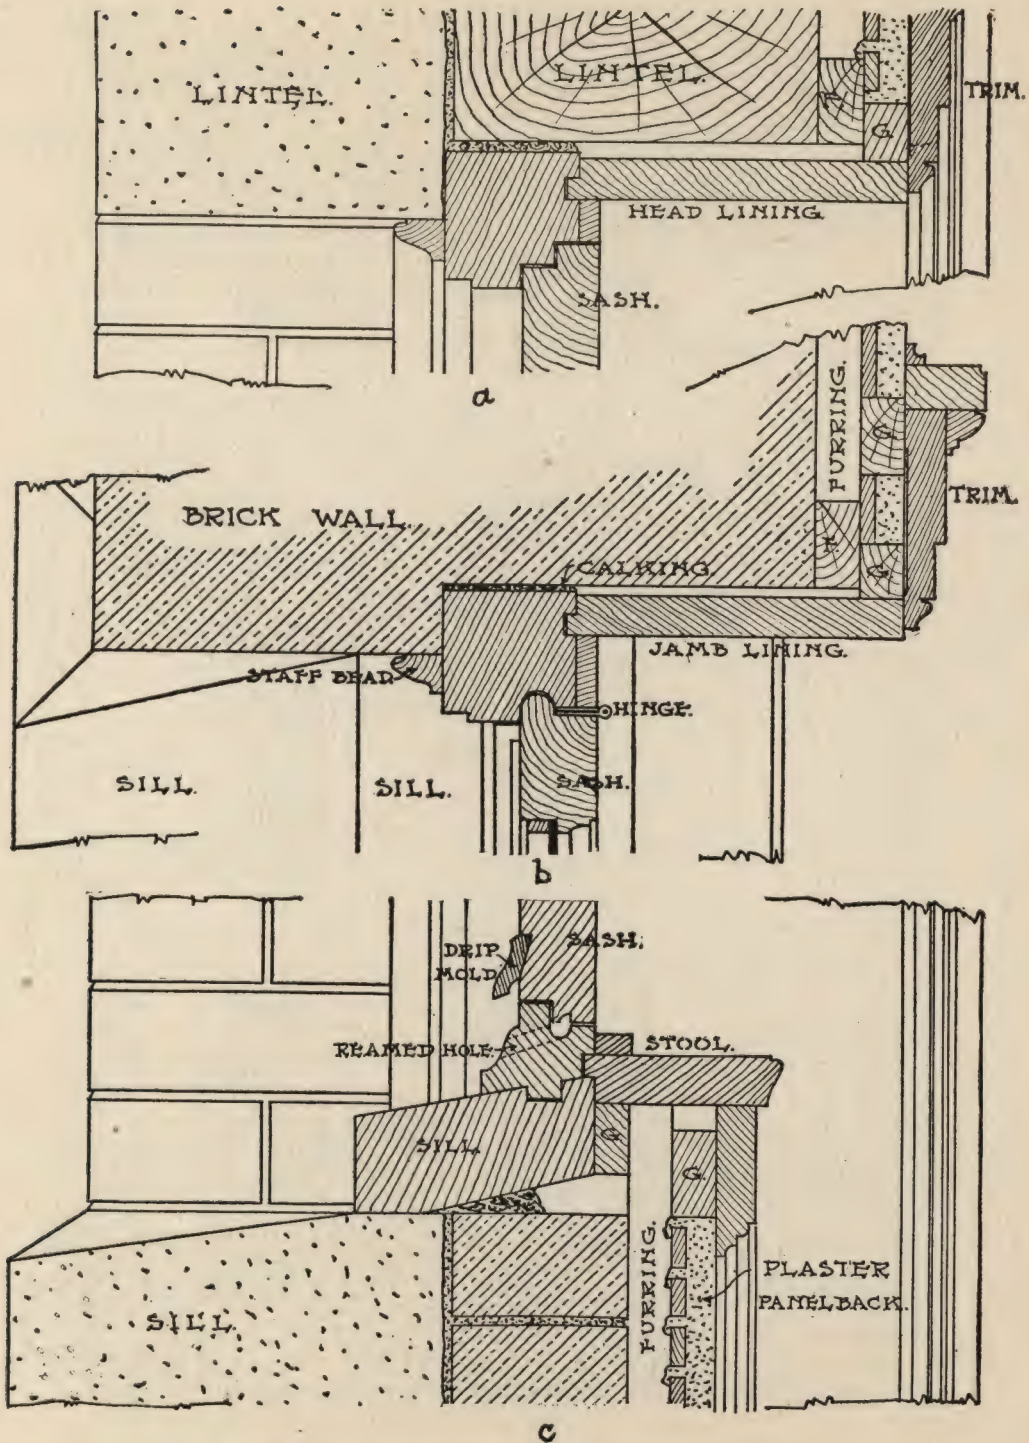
STORM-PROOF INWARD-OPENING CASEMENT.
